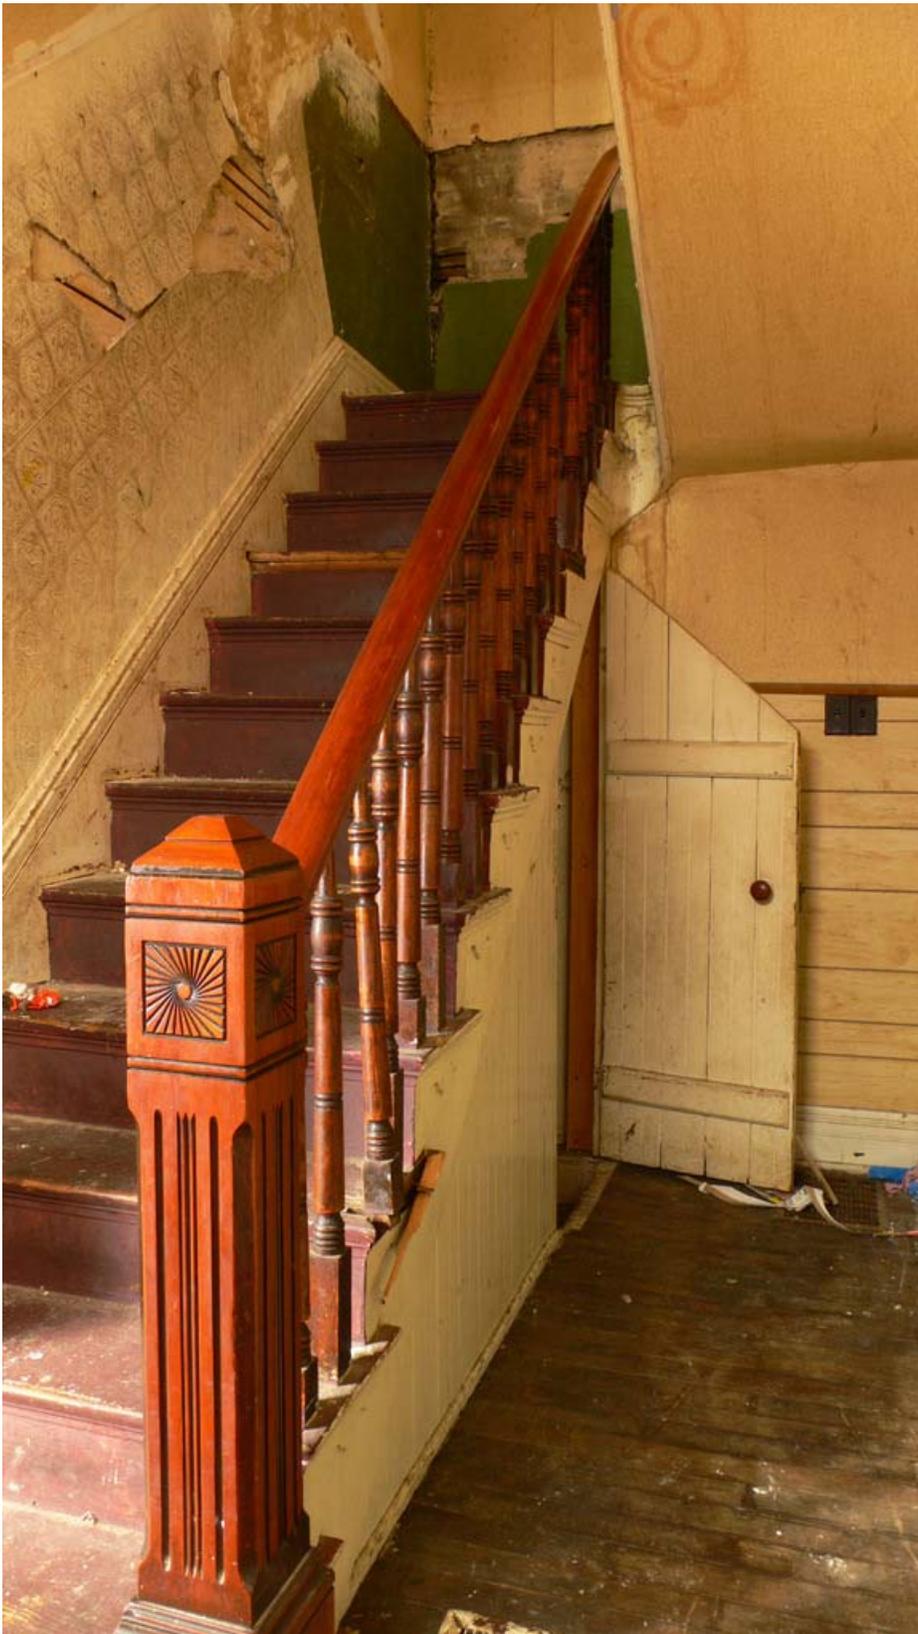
411 West 12 Street, Stair Hall. *The open door at the back leads to a cellar stair.
